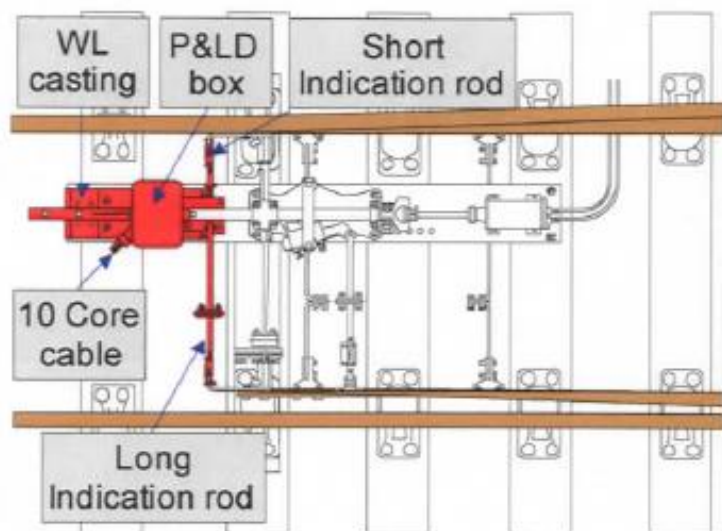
Point and lock detection box assembly [27, p.51]
